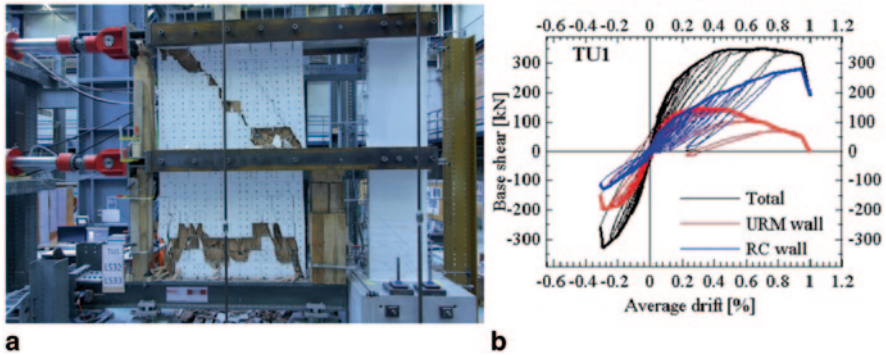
Quasi-static cyclic tests on system with a RC wall and an URM wall: Crack pattern after axial load failure of the unreinforced masonry wall (a) and horizontal force-displacement hysteresis (b) (Paparo and Beyer 2014)
